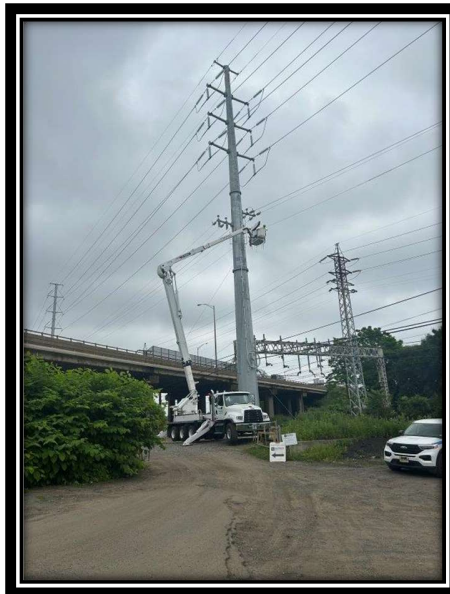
Typical overhead electrical work-fully constructed poles.
